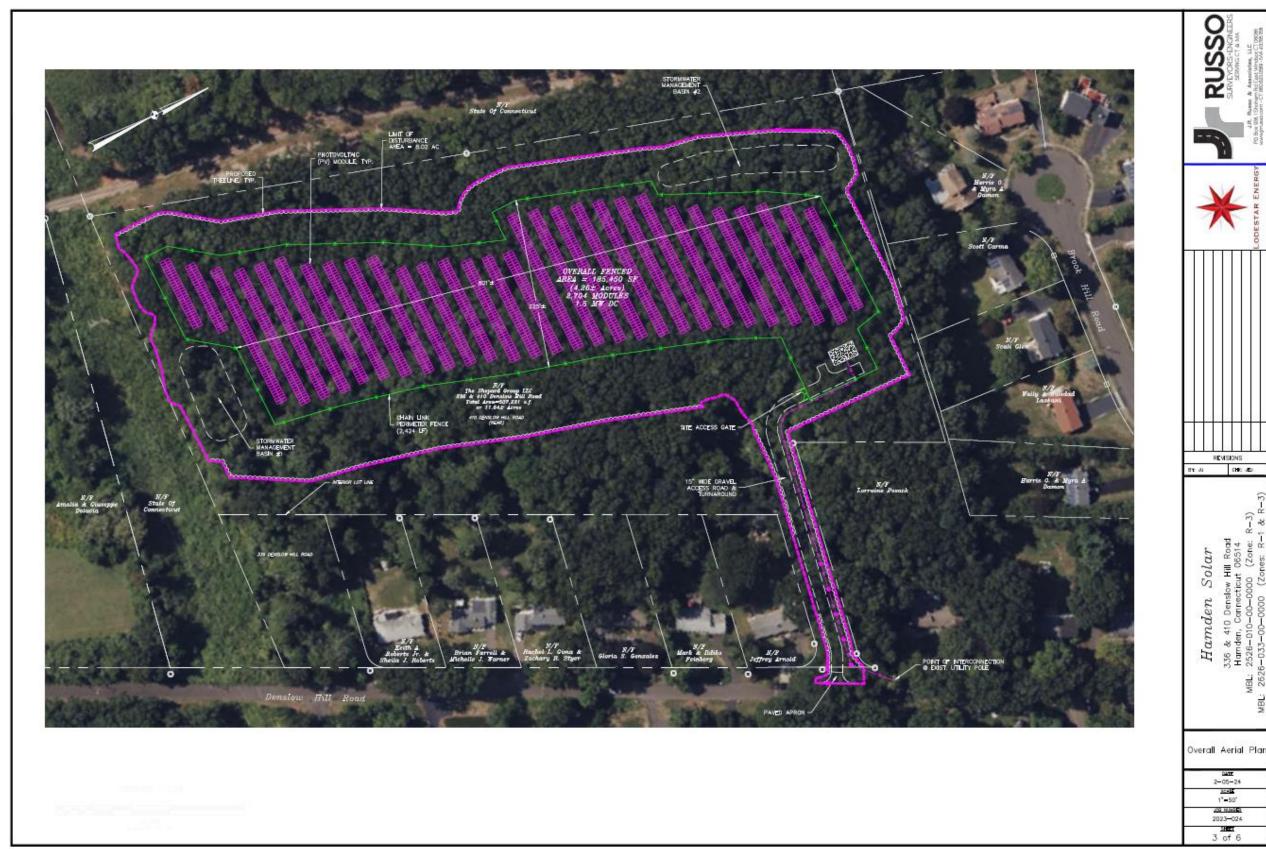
Proposed project plans for the solar facility at 410 Denslow Hill Road in Hamden, Connecticut.
